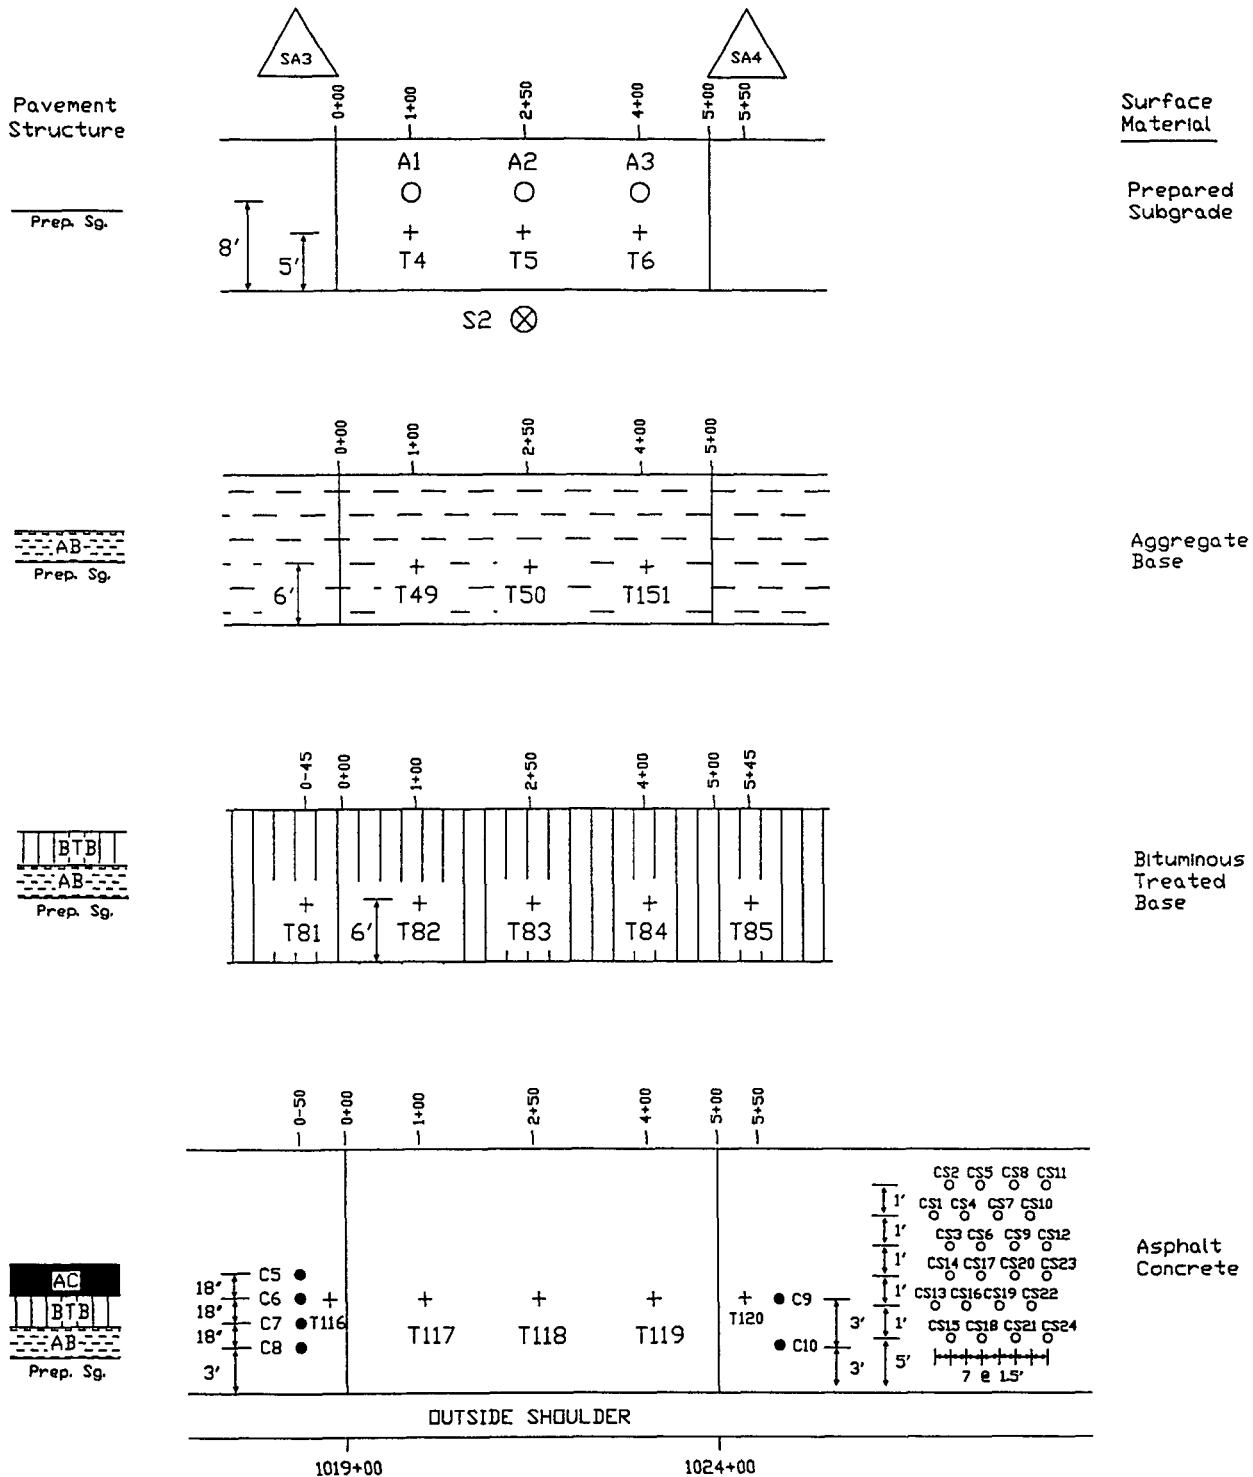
Overview of sampling, testing, and coring plan for sections on SPS-1 Arizona project.
